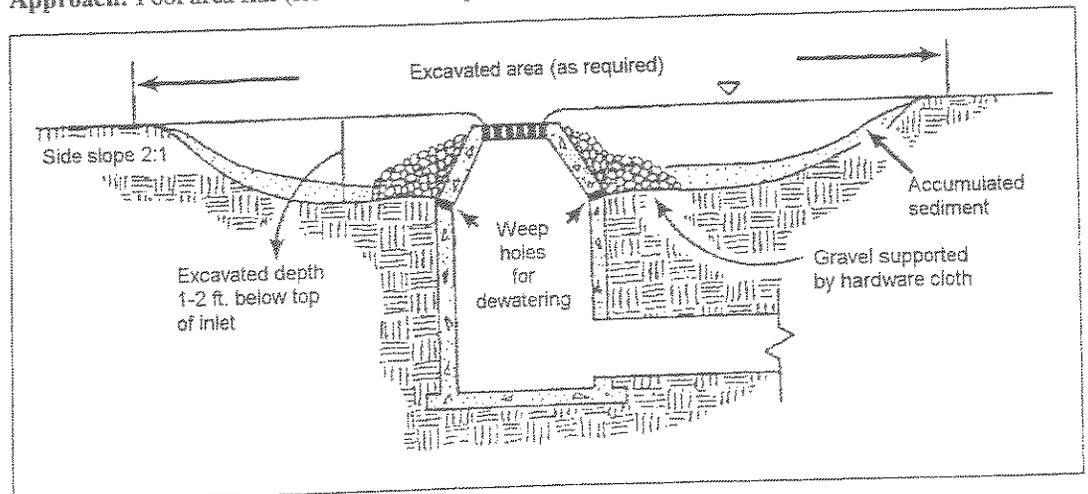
B. Cross-sectional view of an excavated drop inlet protection.
